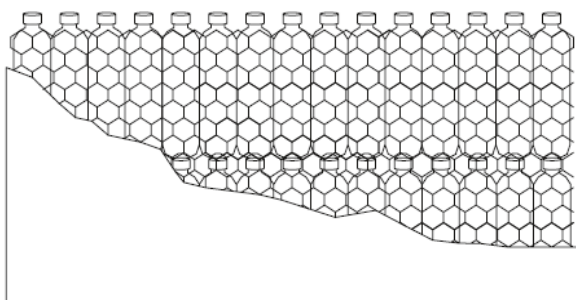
Illustration of Walls built with stuffed bottles between chicken wire. Concrete mix is applied on the surface.
